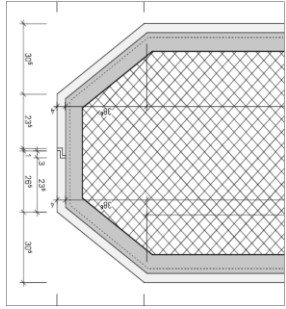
Strengthening of an industrial floor (Bruhwiler and Denarie, 2008)
